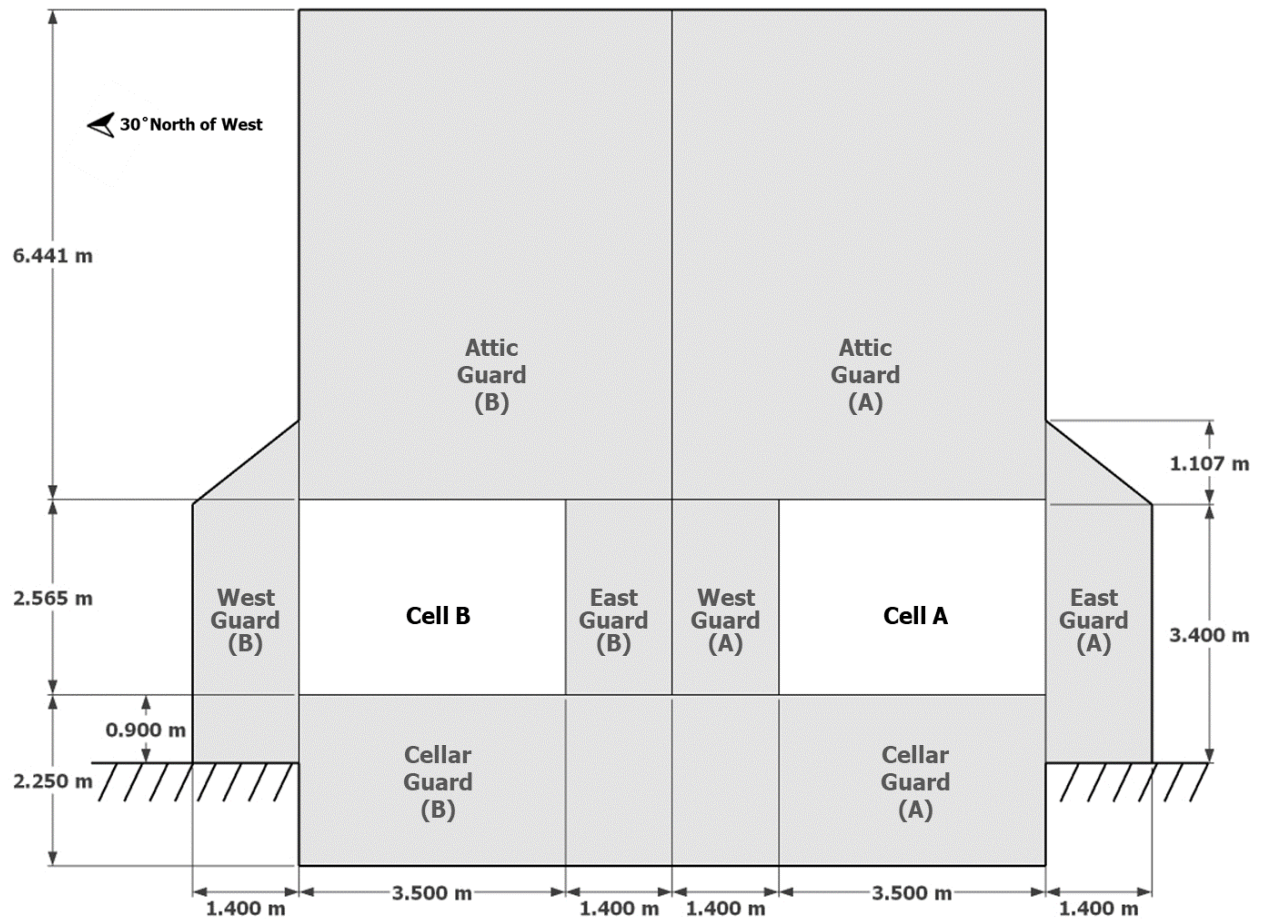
Alternative summary geometry with guard zone dimensions: elevation section looking 30° east of north through page
